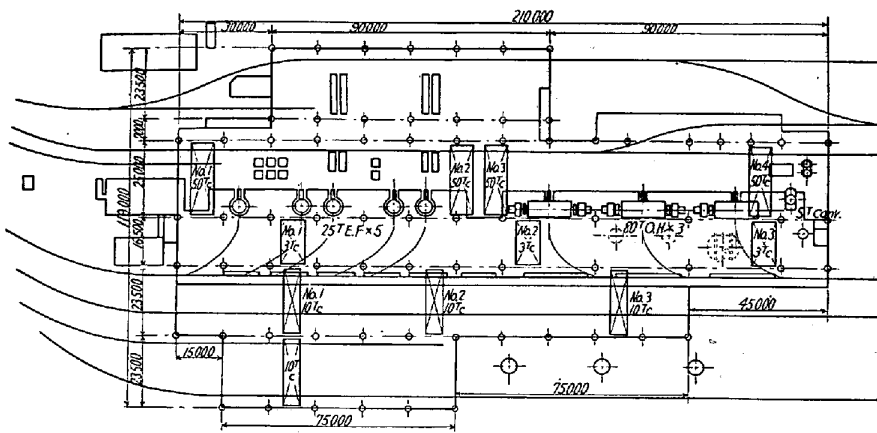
Plan of the Kukioka electric steel plant before erection of converters.
